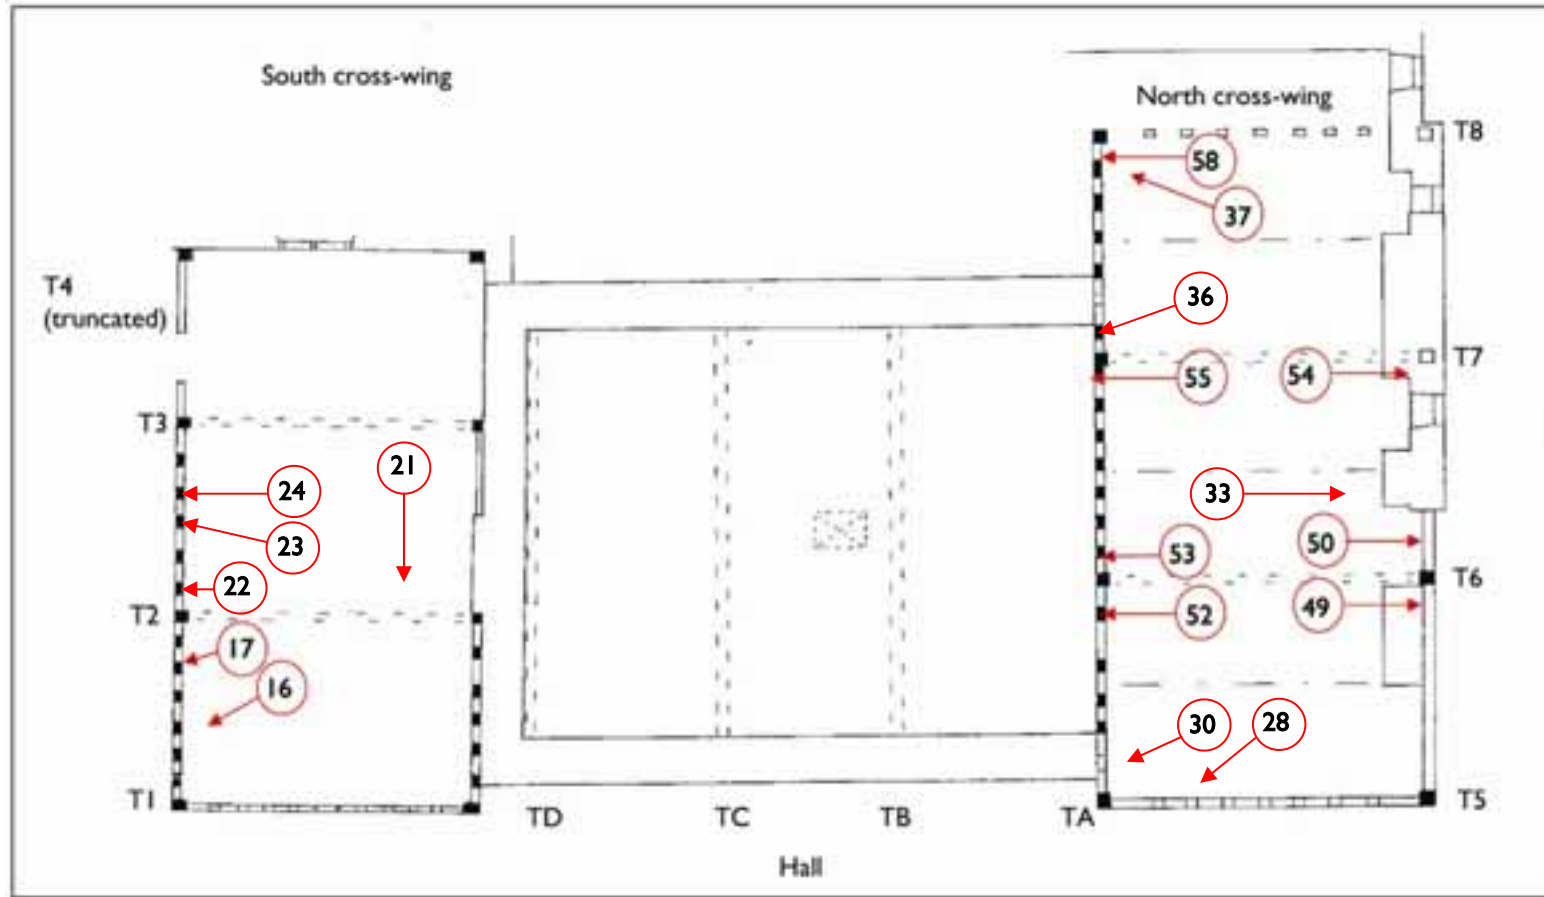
Upper floor plan showing location of samples not shown on the elevation and sections below (based on a drawing provided by N Hill)
